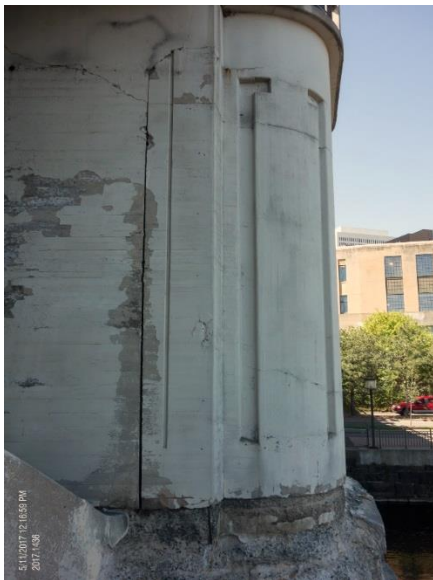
View of north face of Pier 1. Most of the wall face was sound with only isolated cracks and spalls.
